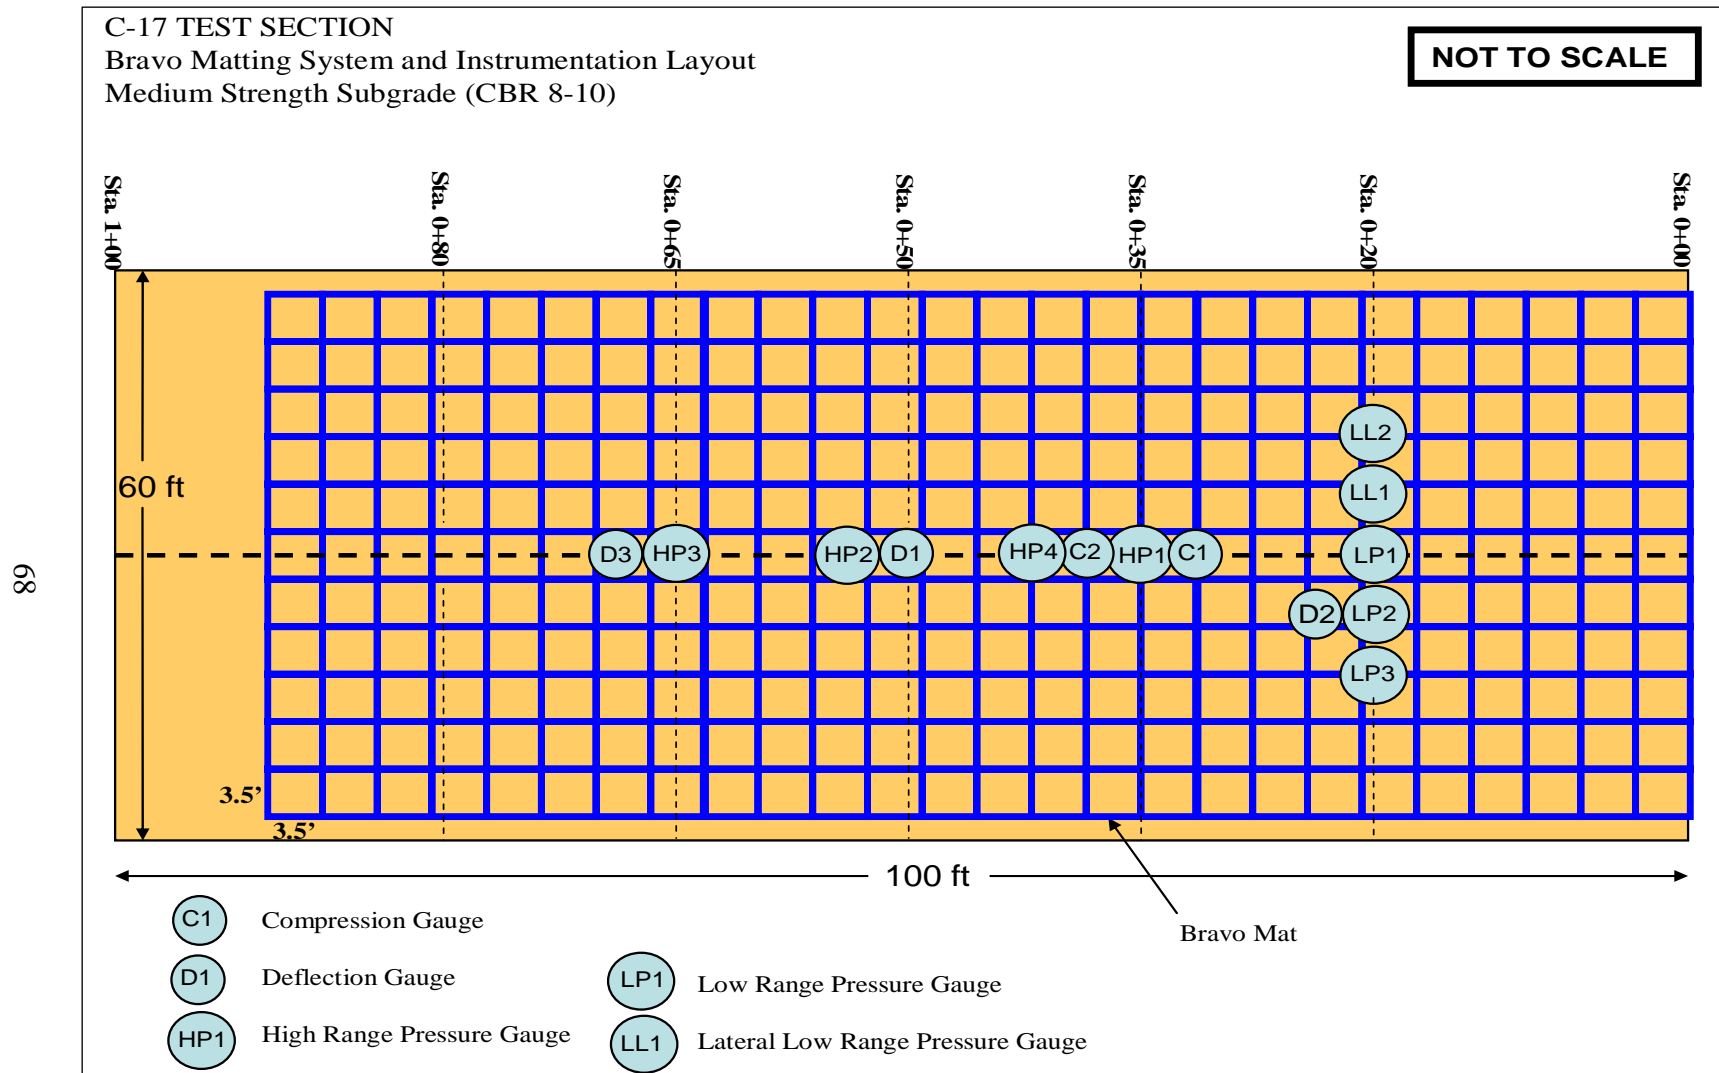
Test Section/Instrumentation Layout – Bravo® Mat System – Silty Sand Test Section
